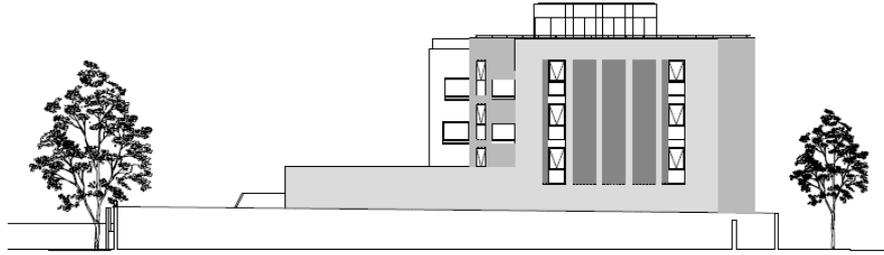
Proposed side elevation of the site facing north showing Compton Lodge on the far side.
